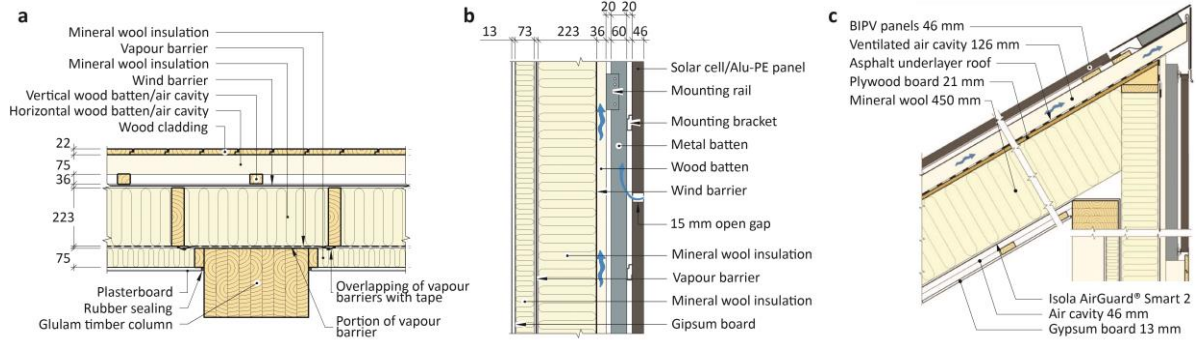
Wall with wood cladding (a), BIPV/Alu-PE panel (b), and BIPV-covered roof (c).
